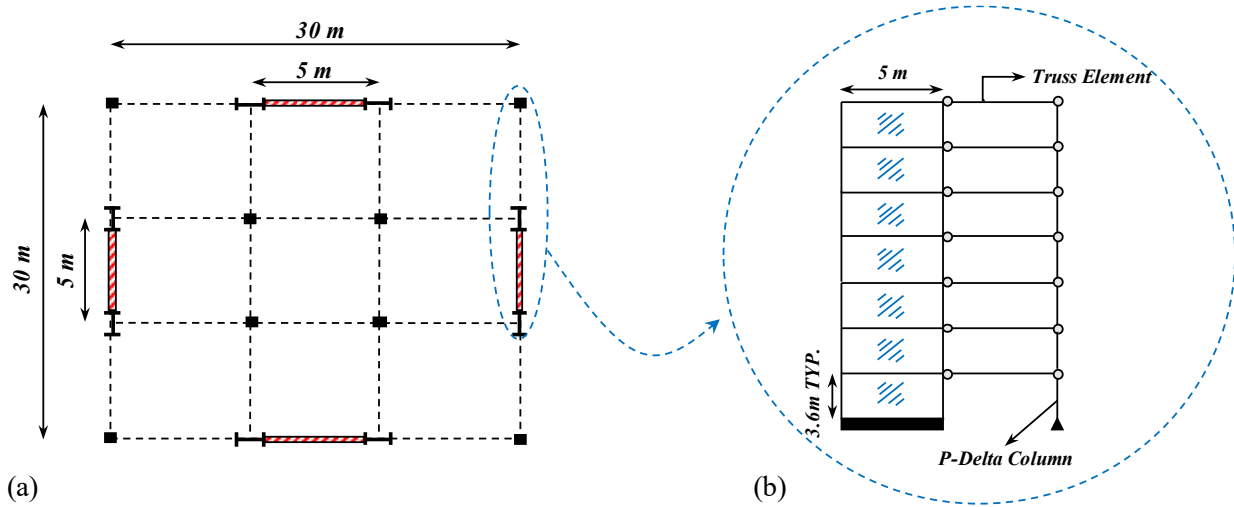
(a) Plan view of sample buildings; (b) analytical model for 7-storey C-PSW along with gravity column
